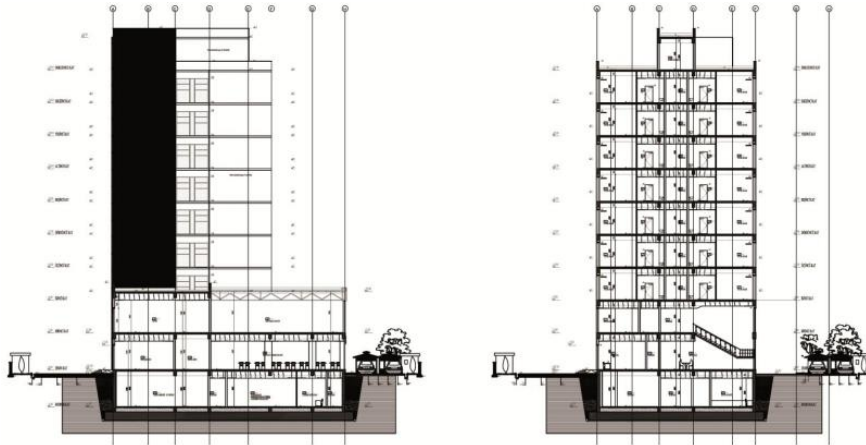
300-bed teacher's house sections, Çelik, 2017
